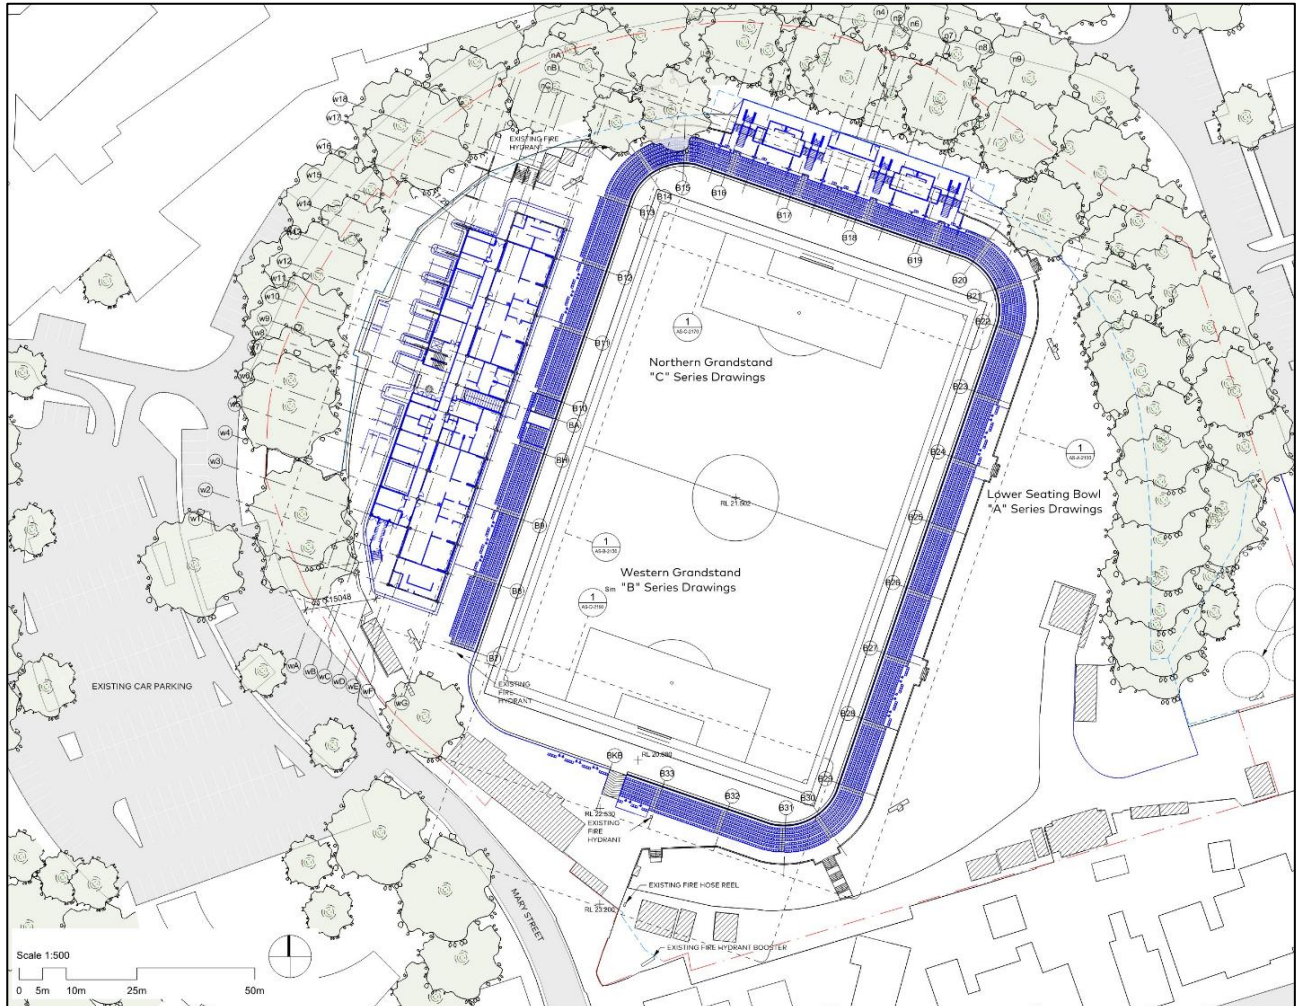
Site plan for Leichhardt Oval refurbishment (Source: COX Drawing Number AS-0-1130)
